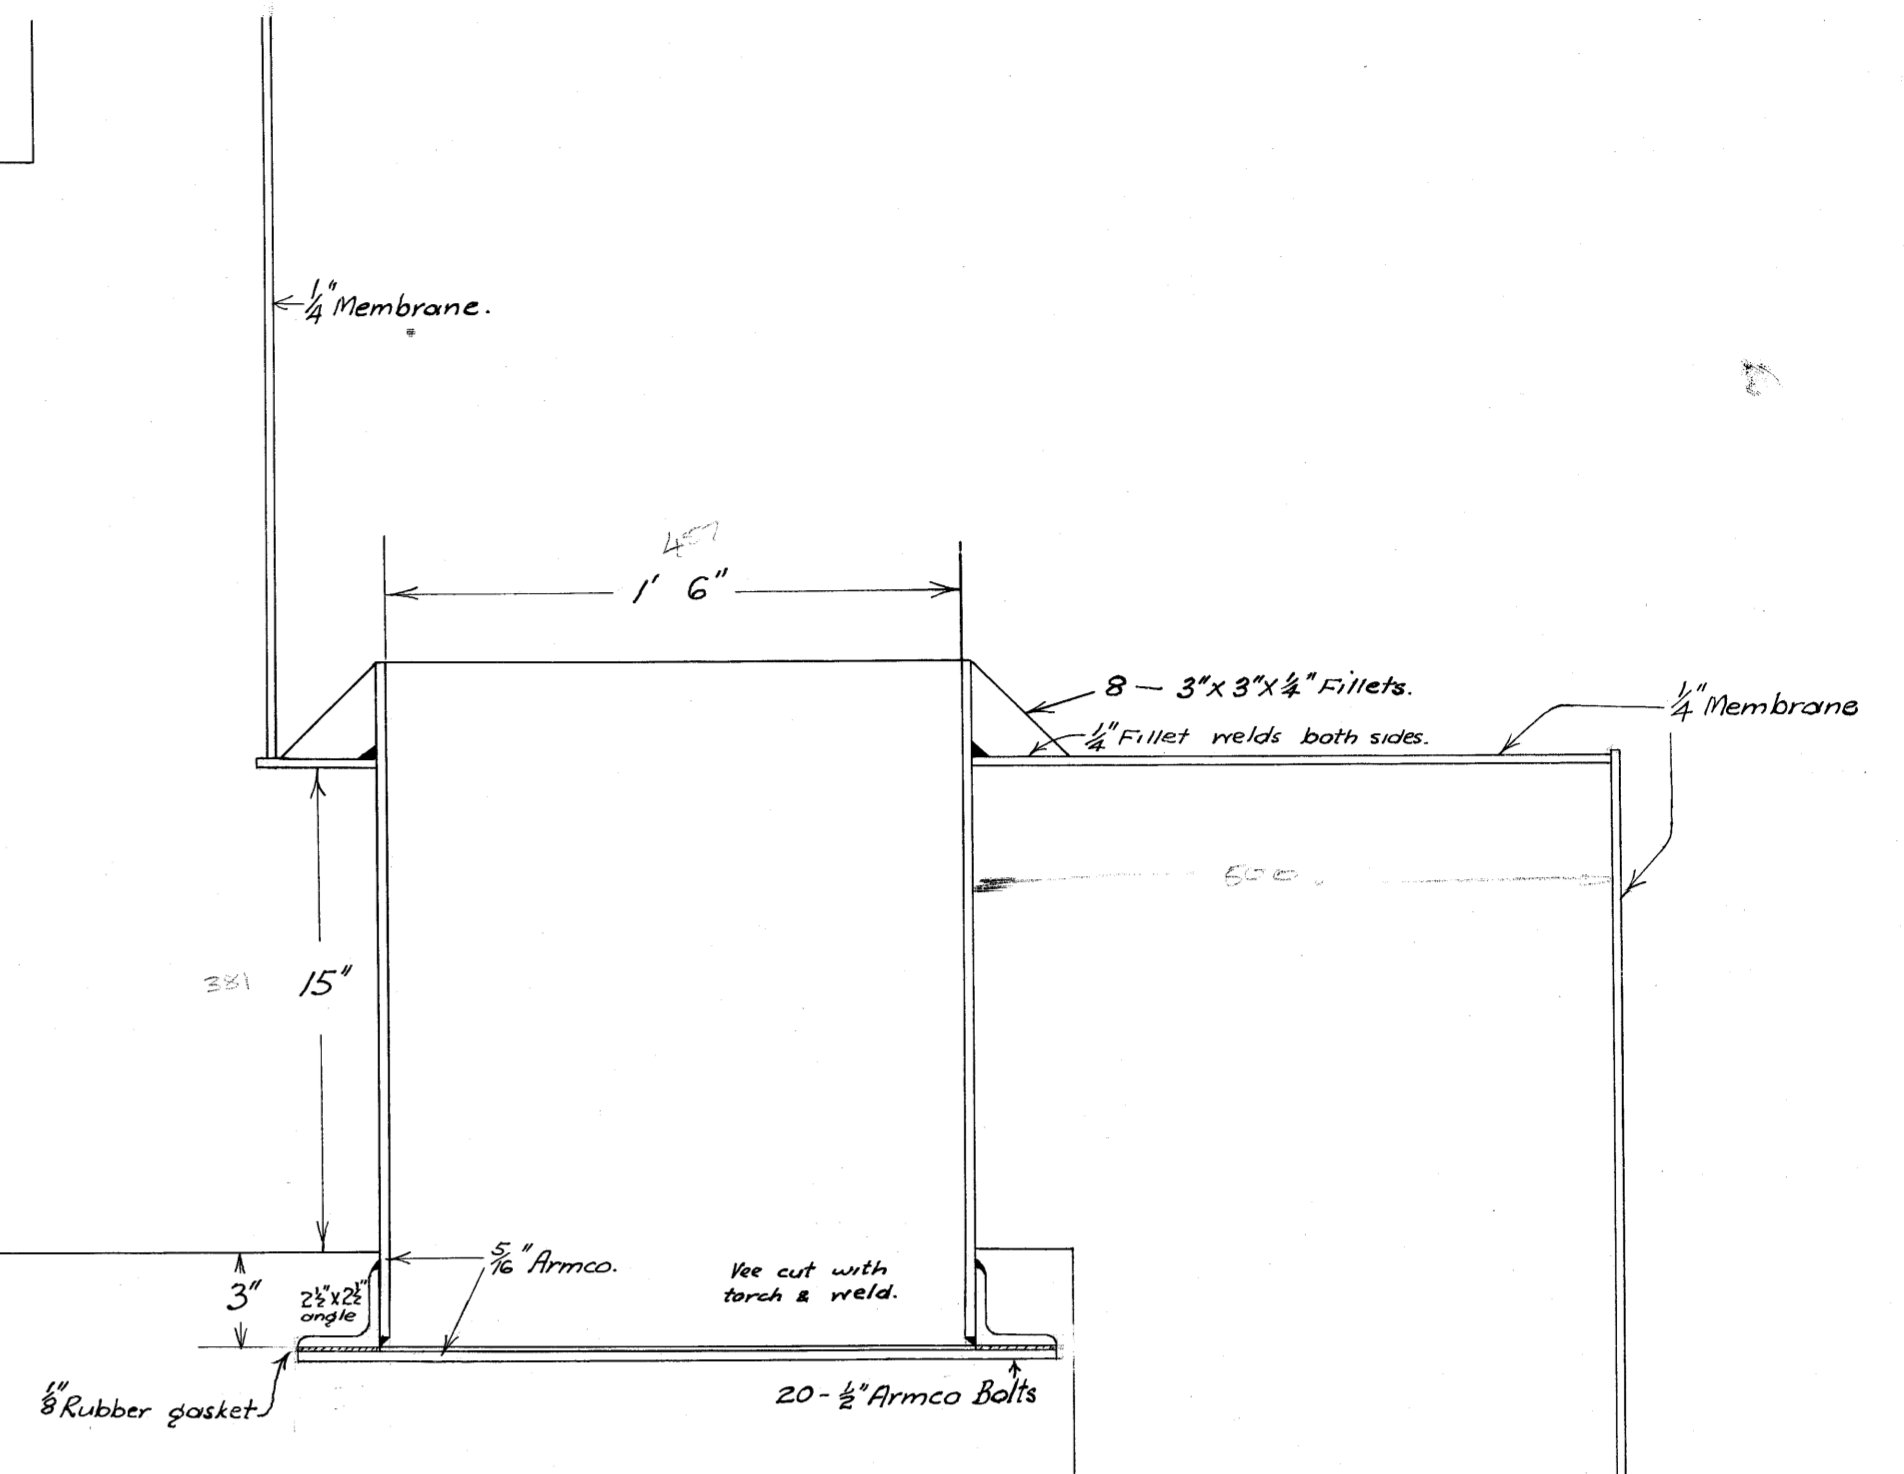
DETAILS OF TANK & FOOTWAY ACCESS LADDERS & MANHOLES.
